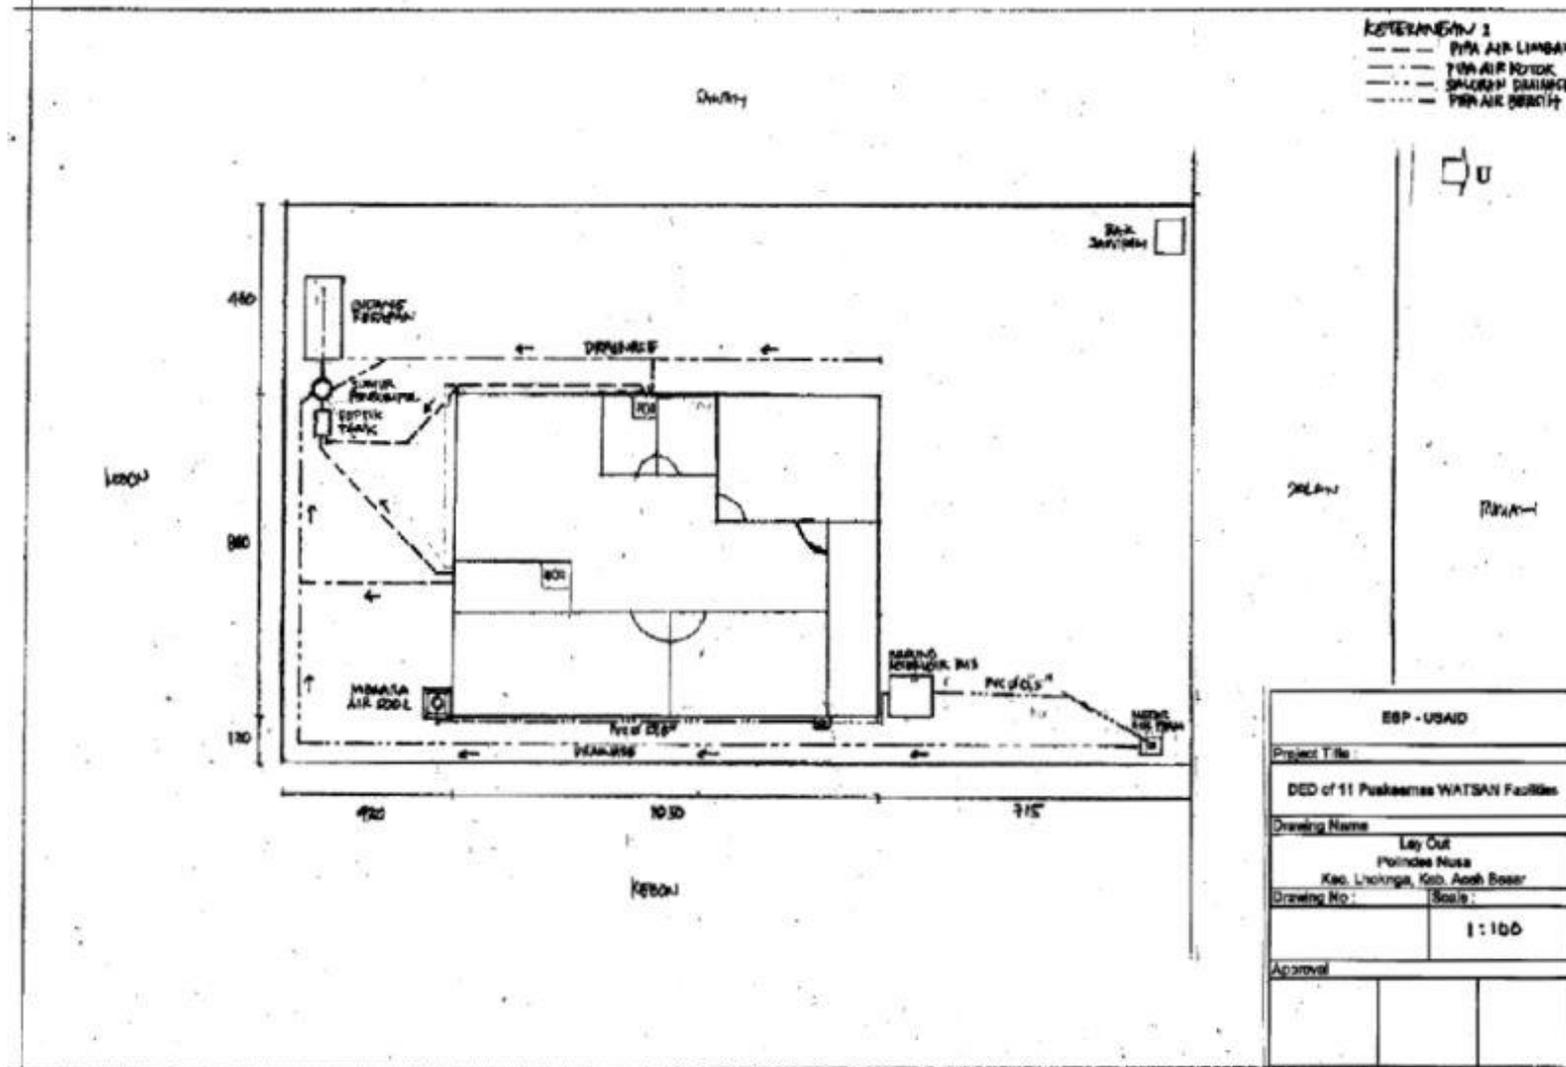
DETAILED ENGINEERING DESIGN OF WATSAN FACILITIES
